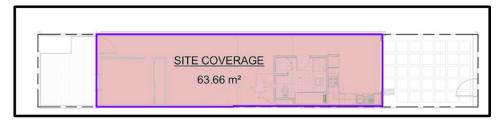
Proposed Site Coverage (Source: 3 Lines Architectural Designs, 2020).
